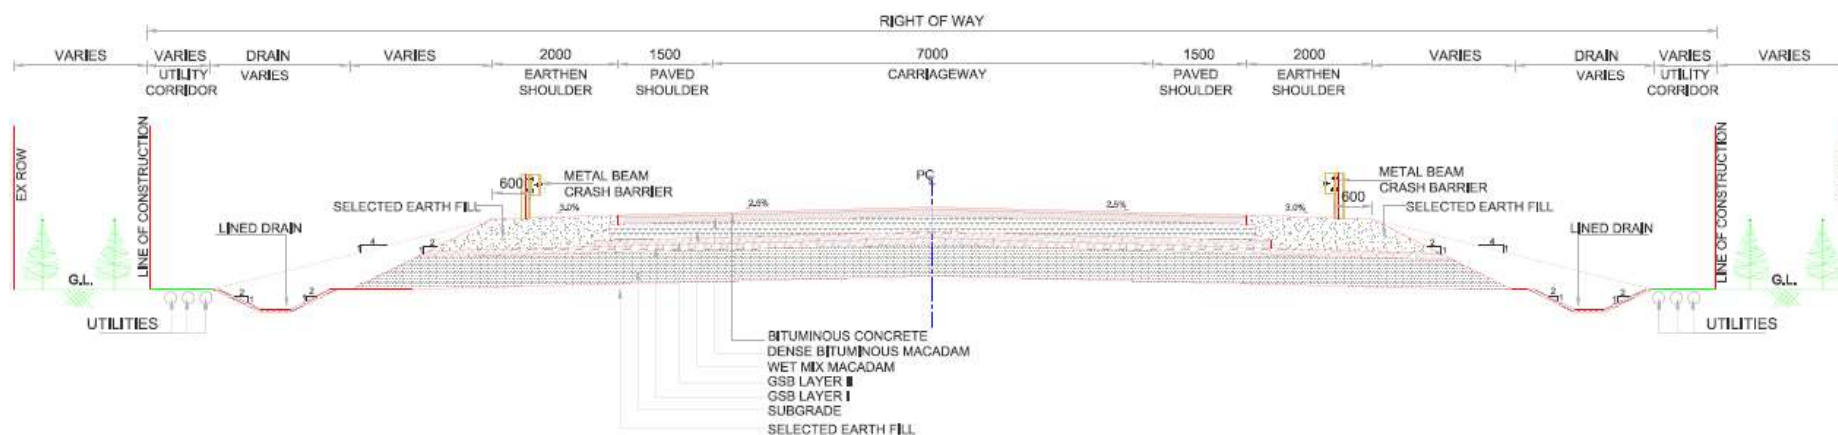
TCS-2 Two lane carriageway with paved shoulder in rural area embankment more than 3.0 m height (new construction)
